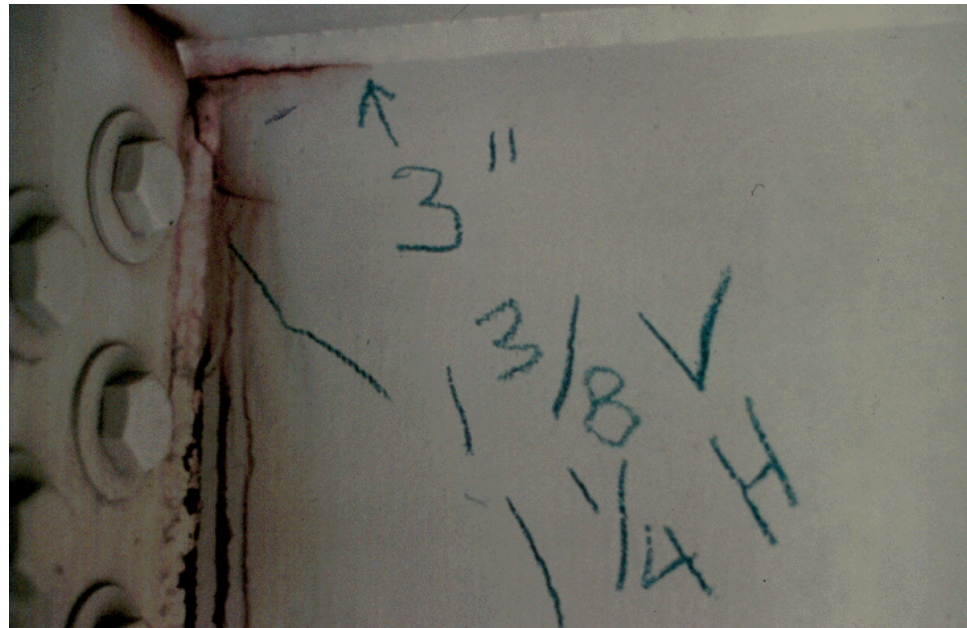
Cracks at Top of Floorbeam Connection to Girder
